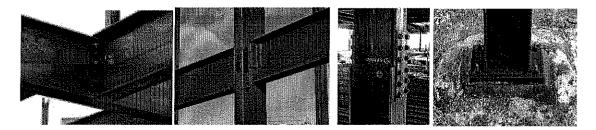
Different types of connections in a steel building: beam to beam, beam to column, column to column, and column base plate (Source: AISC)
